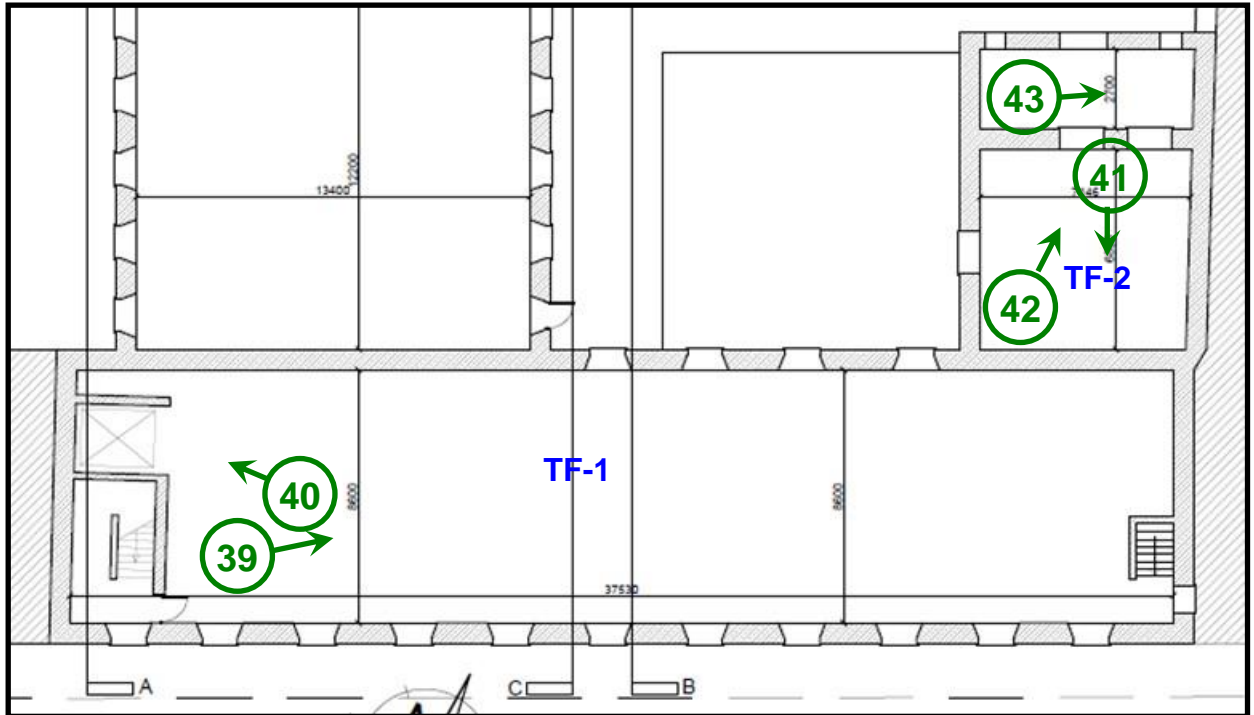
Third-floor plan of front of building, with room numbers and photograph locations
